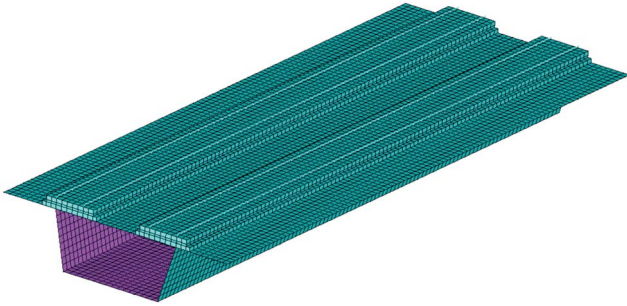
Finite element model of a single-room box girder with slab-tracks.
